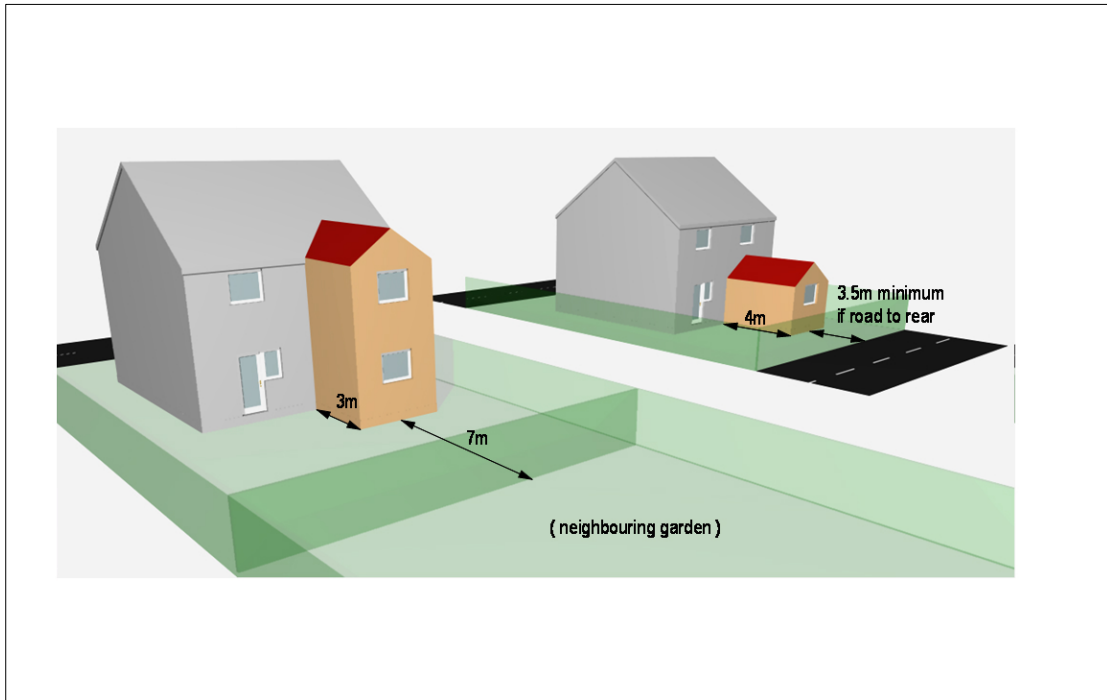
Single and Two Storey Extensions to Detached Dwellings
